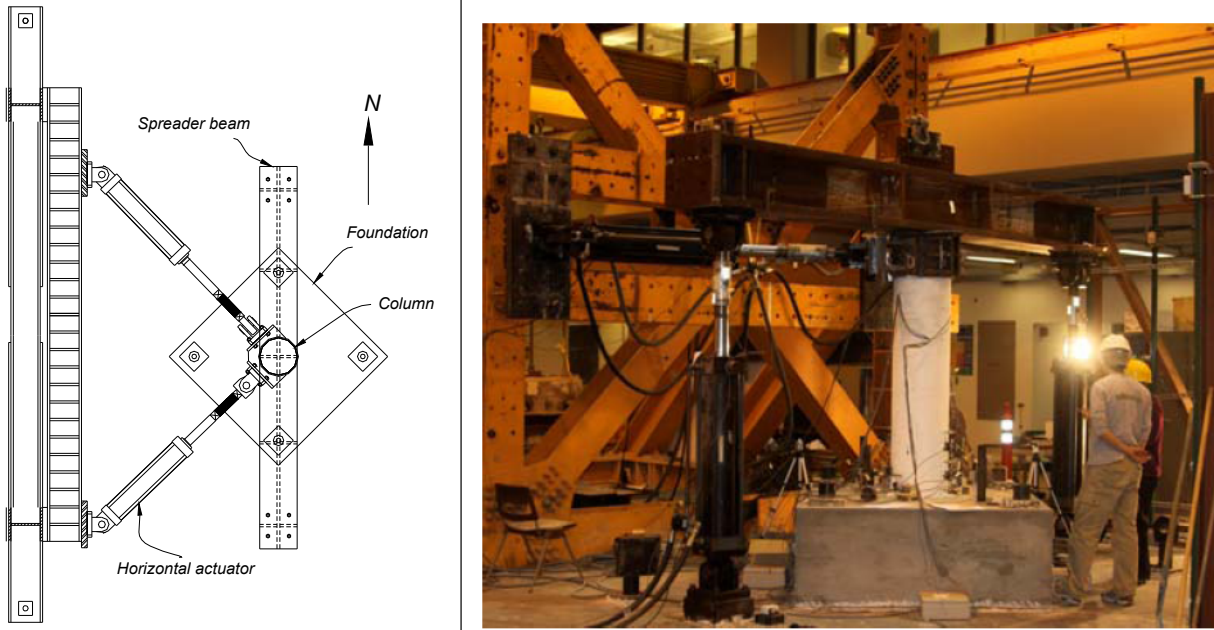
Plan and global views of the test configuration (Panagiotou et al. 2014).
